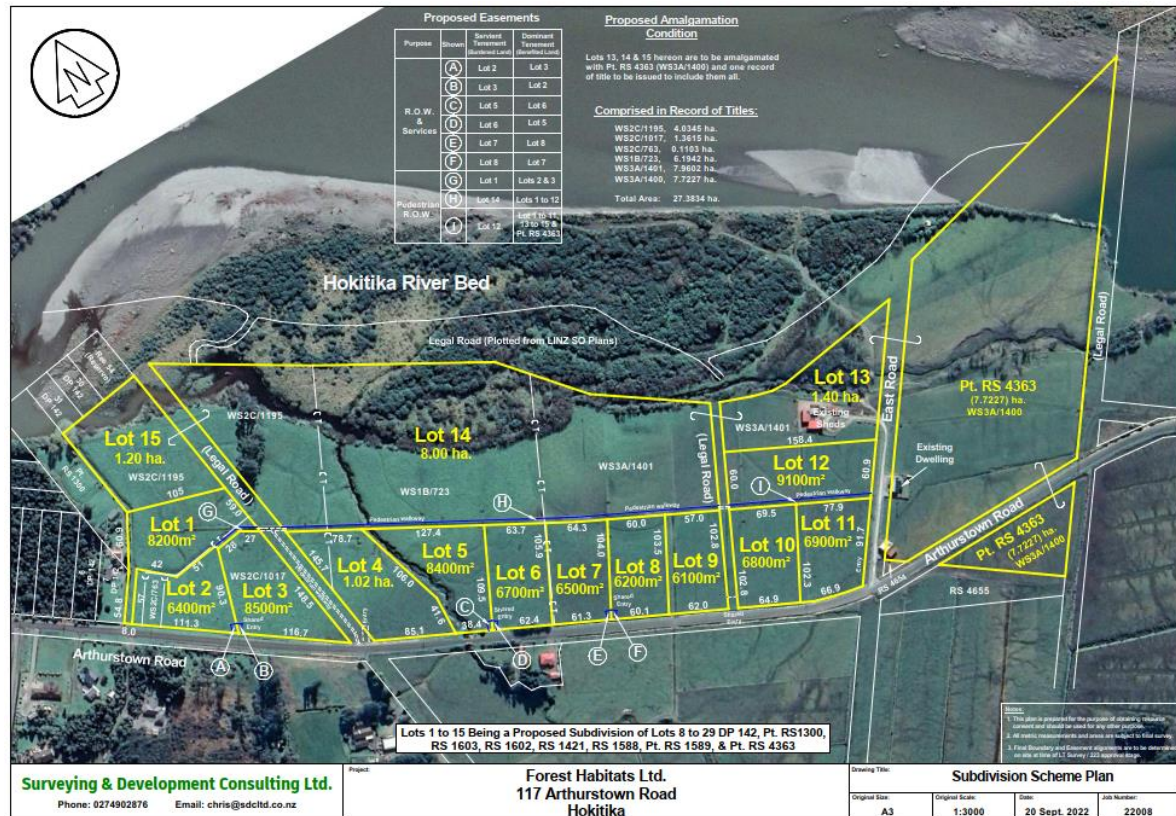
Copy of the proposed subdivision scheme plan (Surveying & Development Consulting Ltd, Sept 2022).
